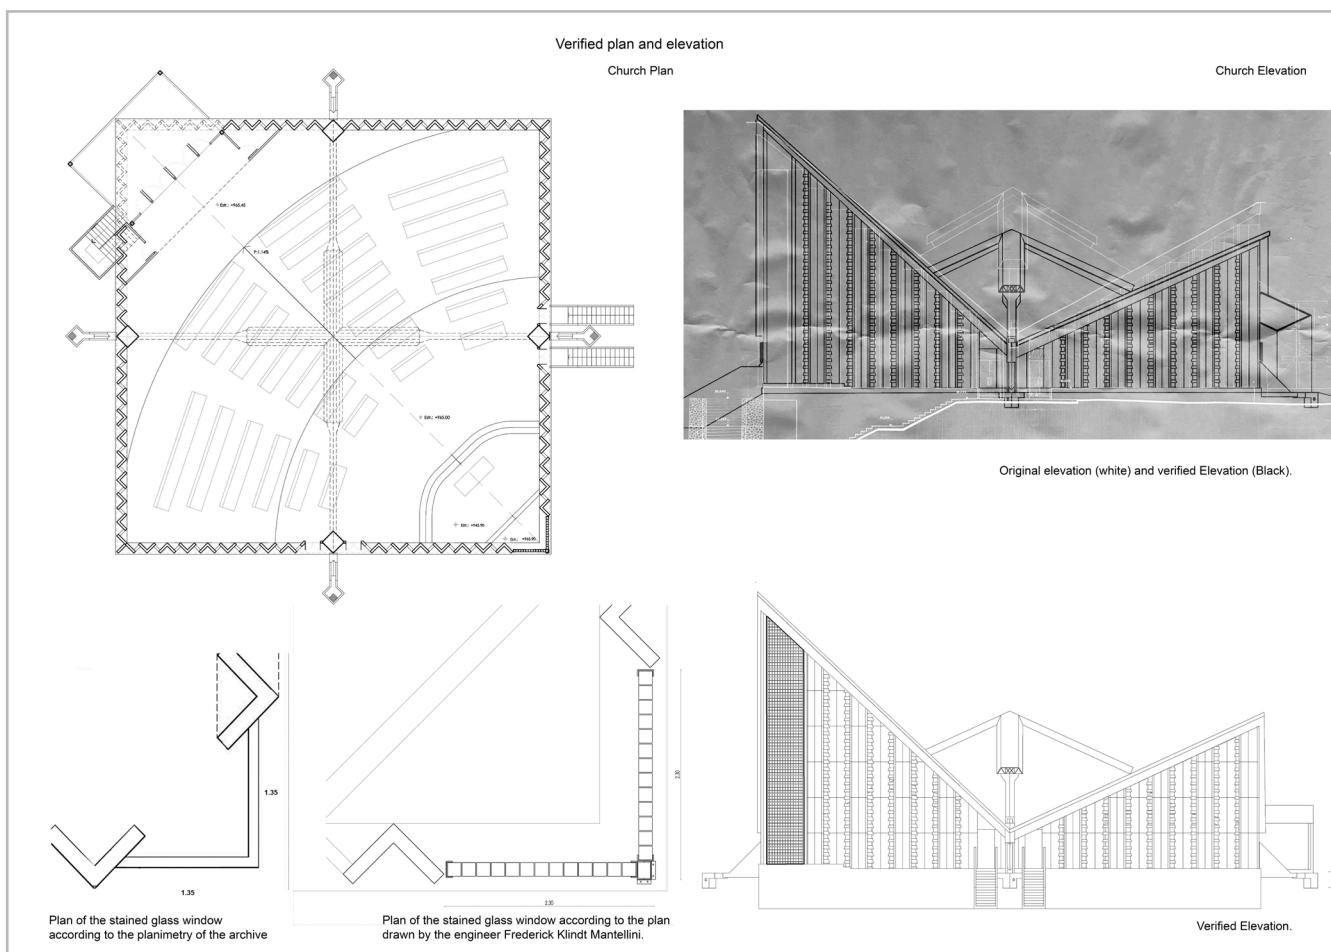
Verified floor plan and elevation of stained-glass window. Source: Prepared by the authors.
